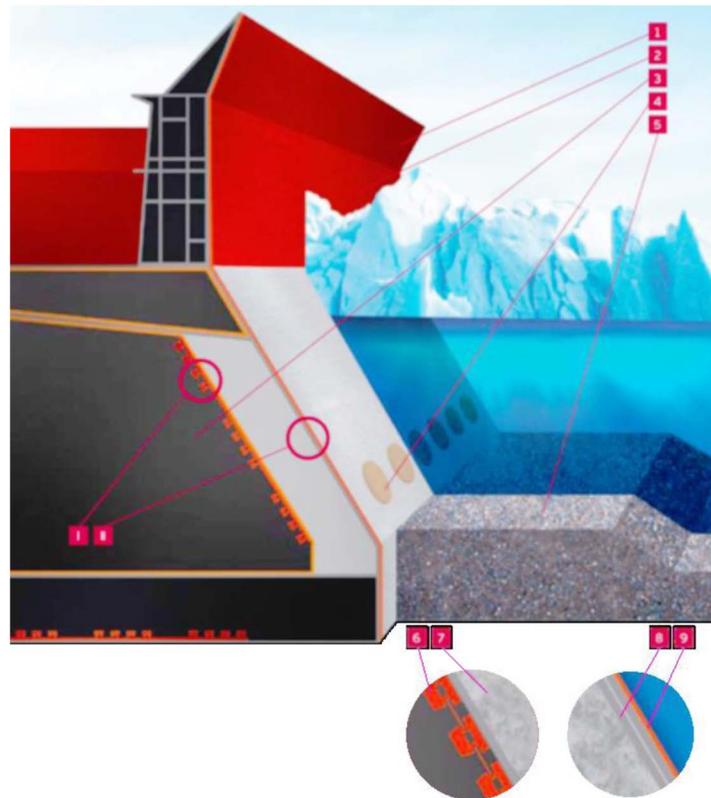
Design of the caisson in the section: 1 - wave deflector, 2 - ice deflector, 3 - resistant paint coating of oil storage tanks, 4 - electrical corrosion protection, 5 - bulk soil layer, 6 - protection against corrosion, 7 - concrete 3 m thick, 8 - double-layer steel sheet, 9 - cladding with stainless steel. Рис. 4. 3D схема кессона. Source: PJSC Gazprom Neft.
